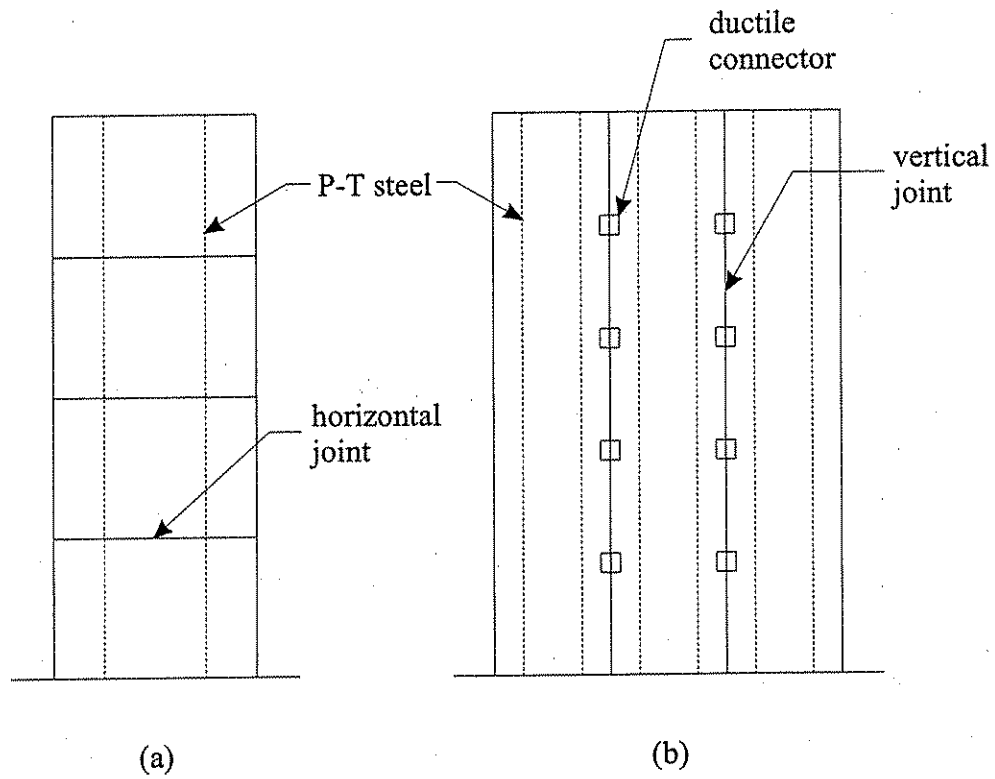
Unbonded post-tensioned walls: (a) with horizontal joints; (b) with vertical joints and ductile connectors.
